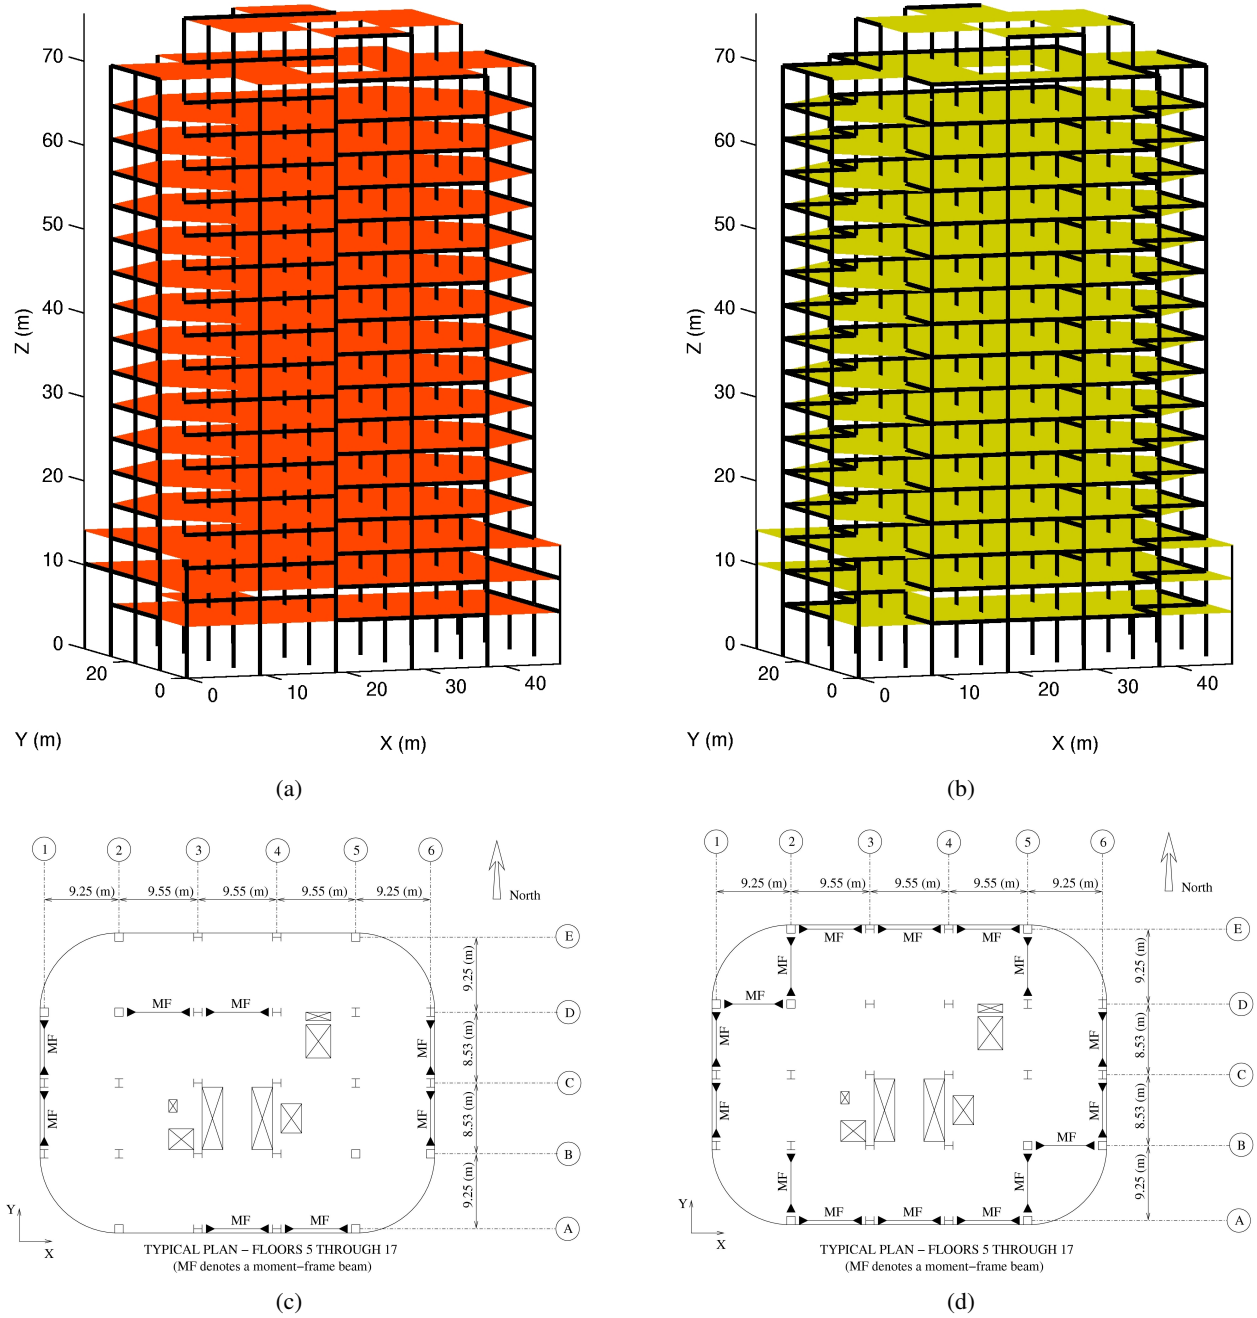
Structural models of the two 18-story steel moment frame buildings: (a) Isometric view of the existing building (designed using the 1982 UBC). (b) Isometric view of the new building (redesigned using the 1997 UBC). (c) Plan view of a typical floor of the existing building showing the location of columns and moment-frame (MF) beams. (d) Plan view of a typical floor of the redesigned building.
